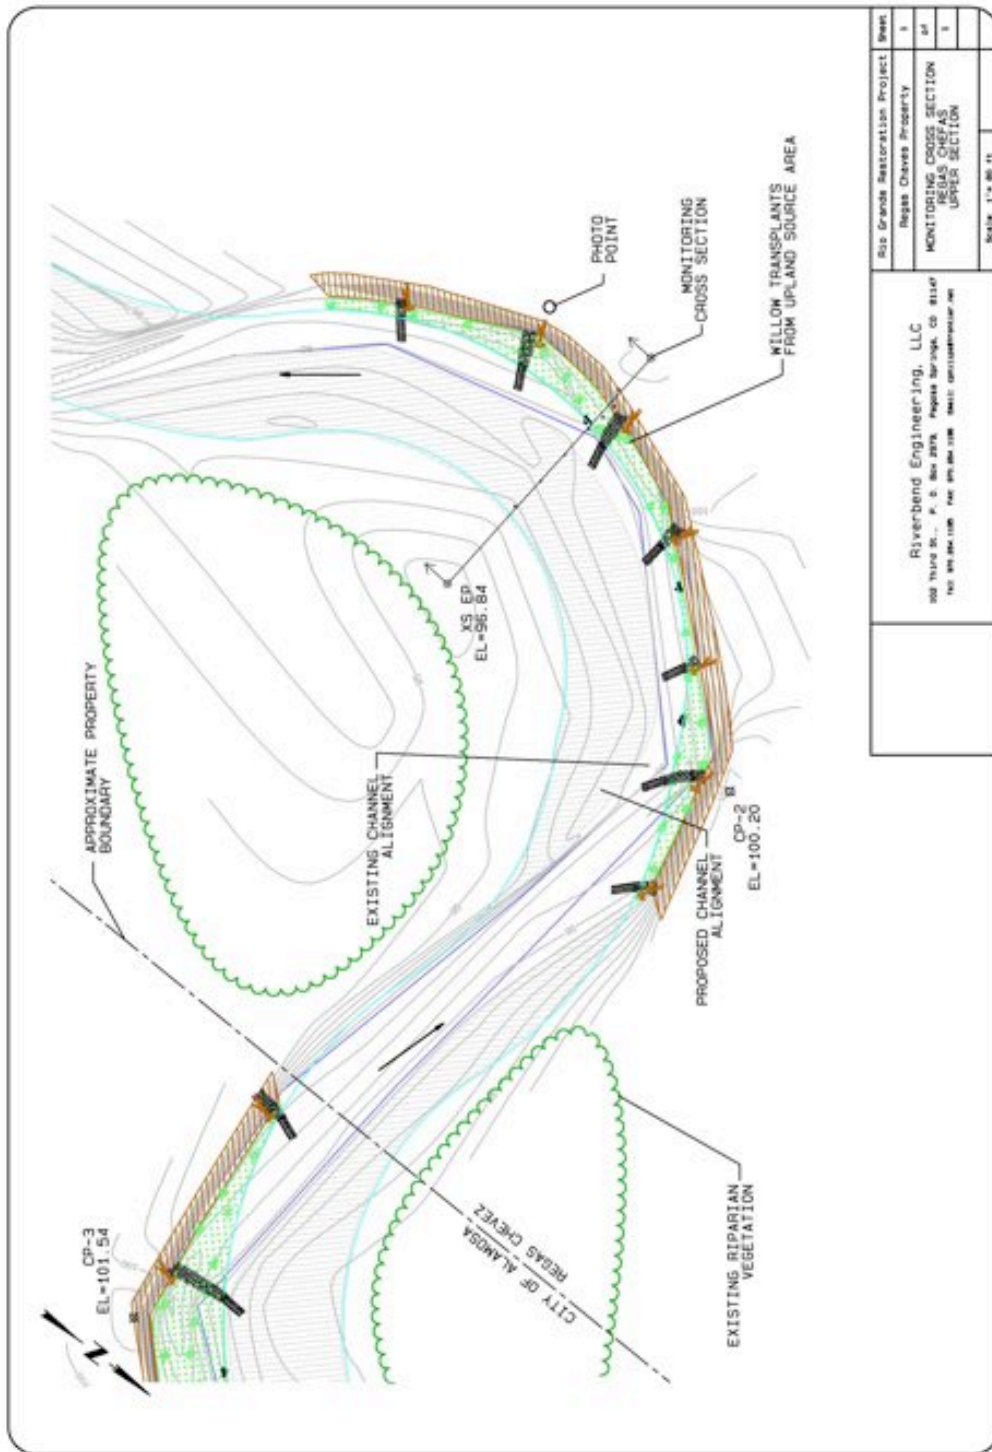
Chefas Site Design, Cross Section Location, and Photopoint Location.
